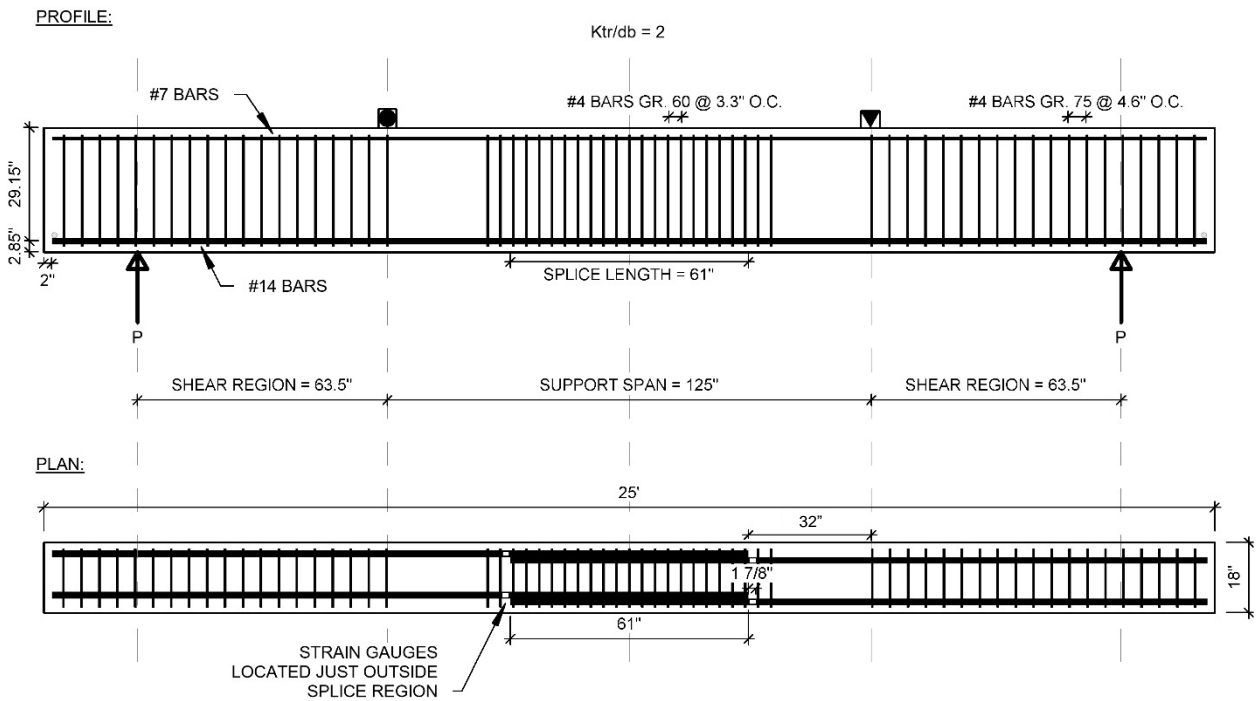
Profile and plan of 14-g (1 in. = 25.4 mm)
